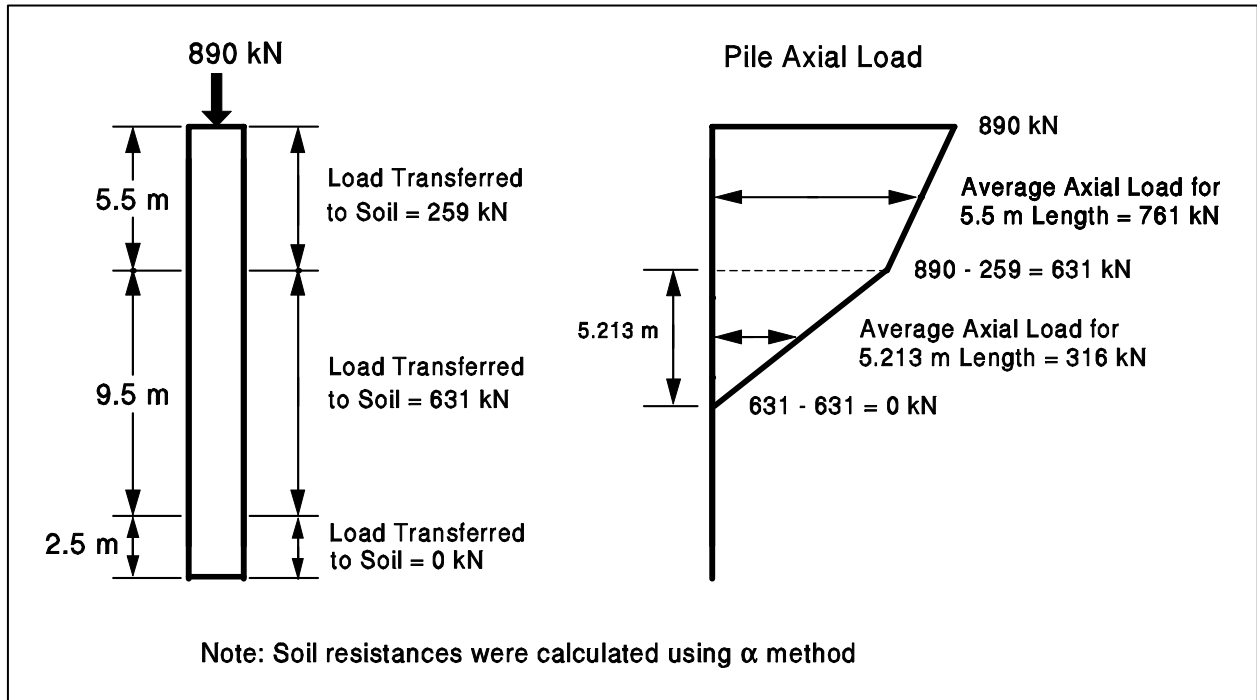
Calculation of Axial Load Transfer to the Pile at South Abutment
